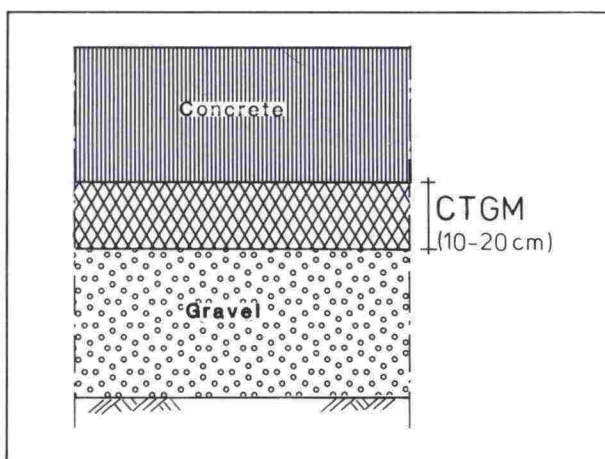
Cement-treated layer as a base of a concrete pavement
